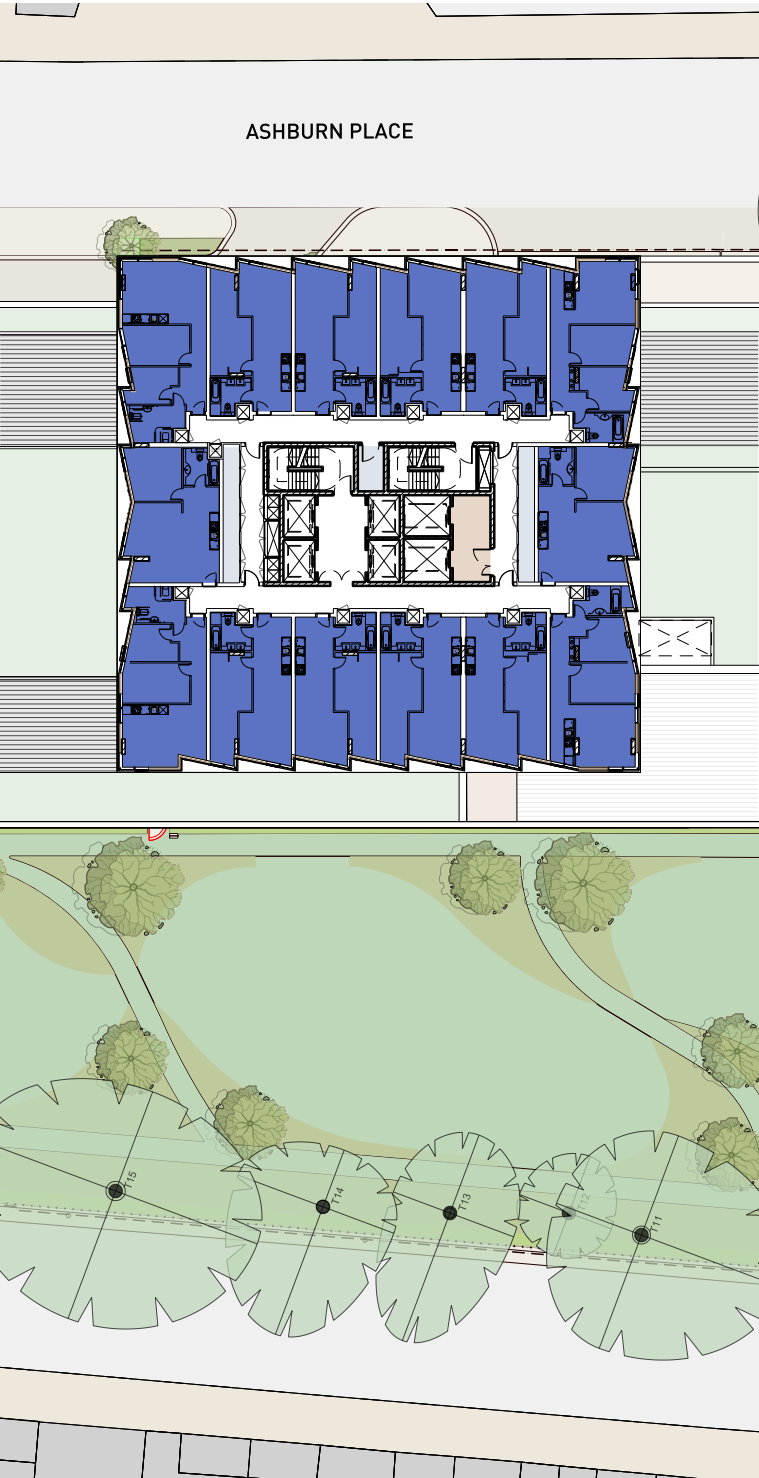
Sixteenth floor plan of the serviced apartment tower
